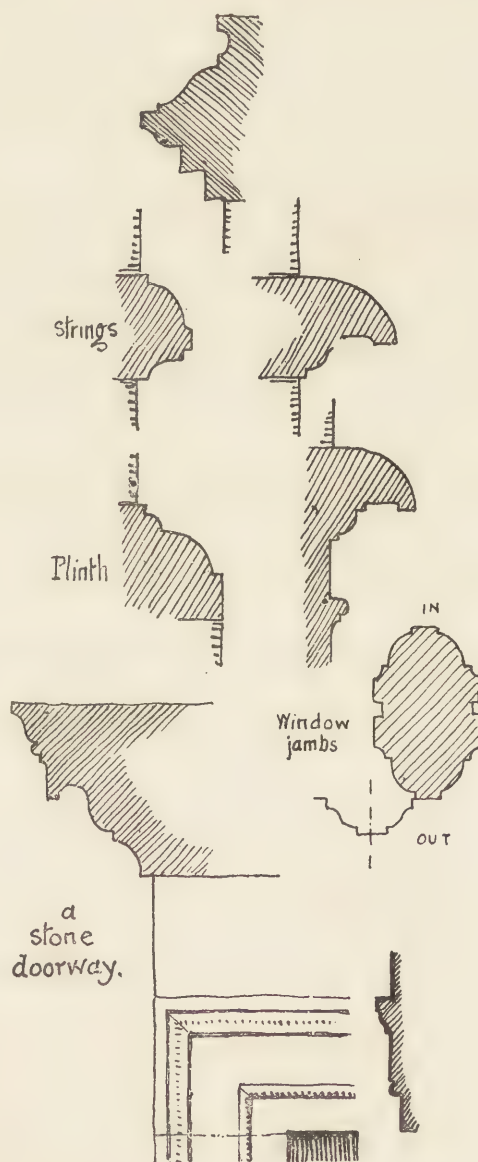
STONE DETAILS AT KIRBY HALL.
